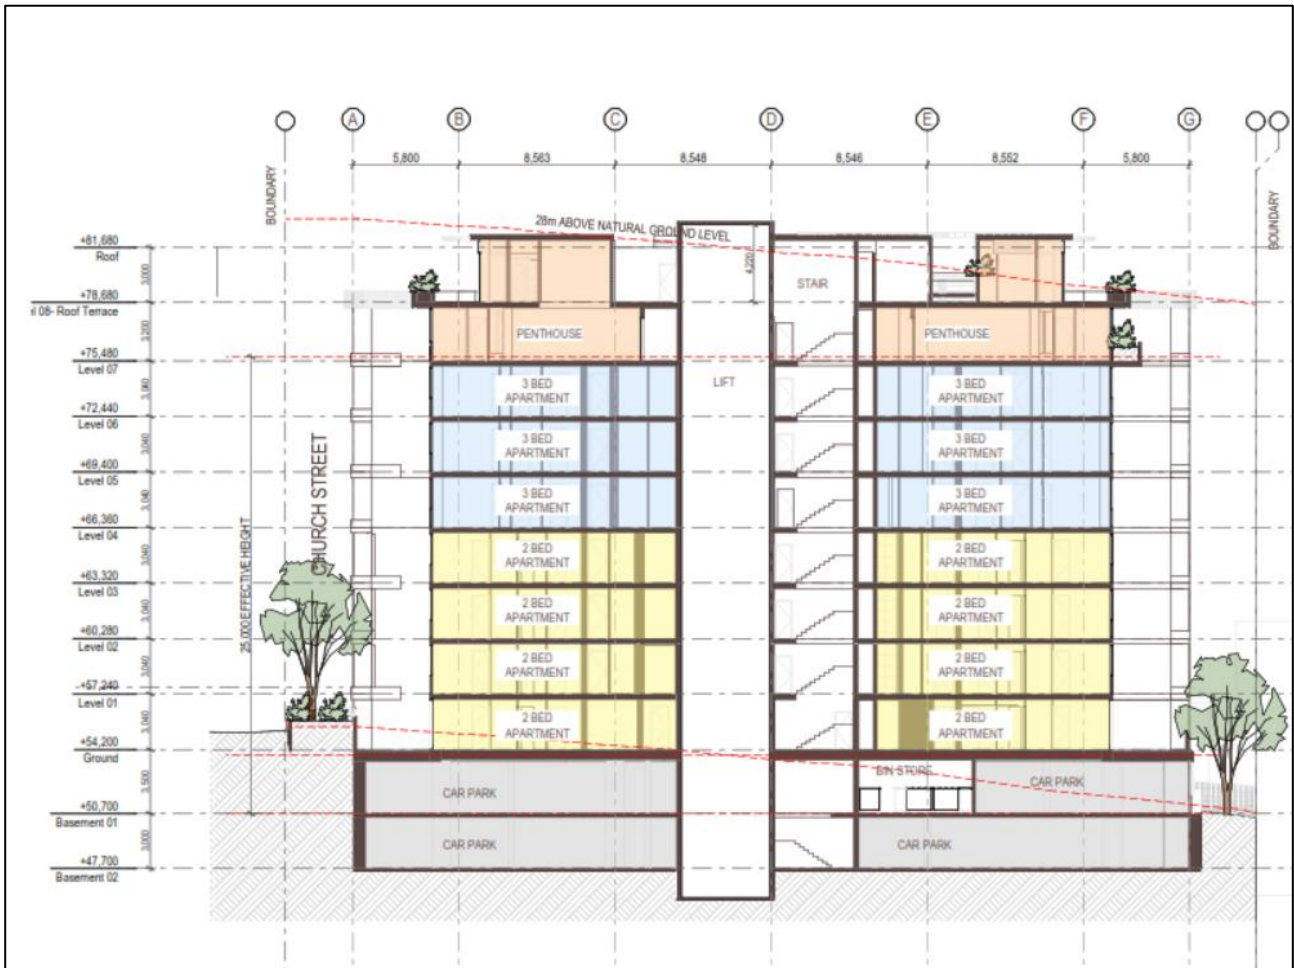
Section A Drawing TP501 from Hayes Anderson Lynch Architects Pty Ltd
